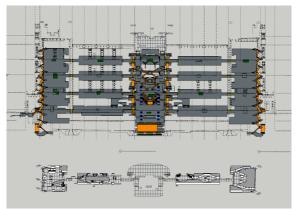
Cultural center museum floor plan rendered in SketchUp.
